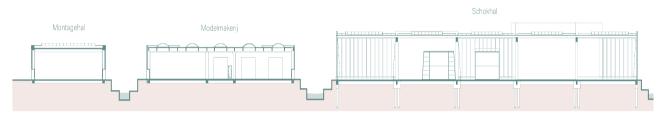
Section Schokbeton excavating outer dike around the industrial heritage (Made by author, 2024)
